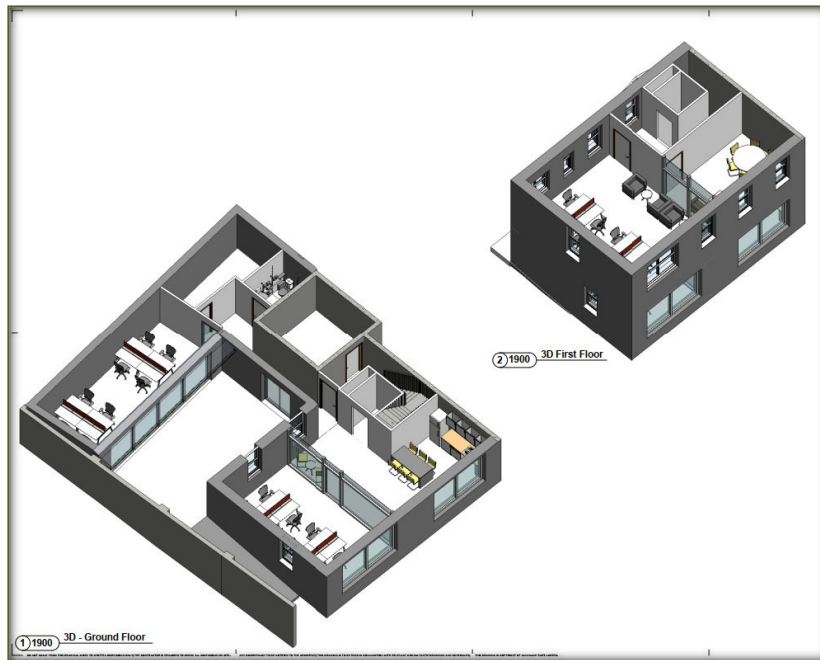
Proposed 3D Models (as prepared by Kavanagh Tuite Architects)
